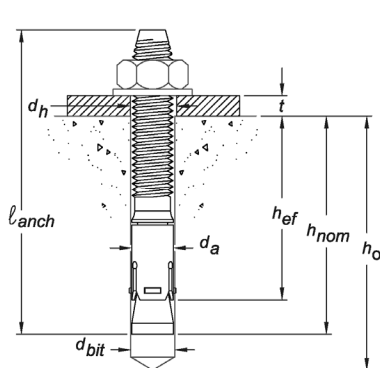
POWER-STUD+ SD2 ANCHOR DETAIL
